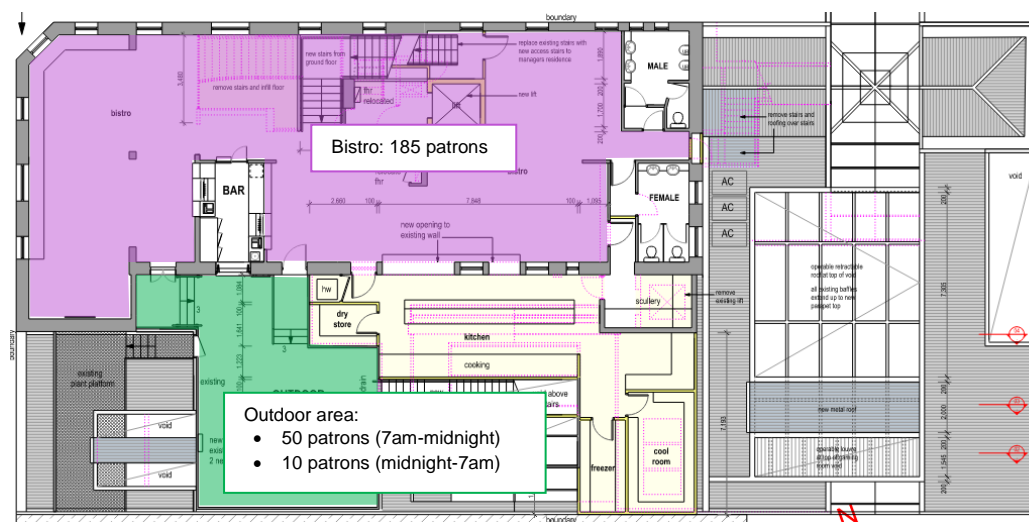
Markup of proposed first floor plan – maximum patron capacity
